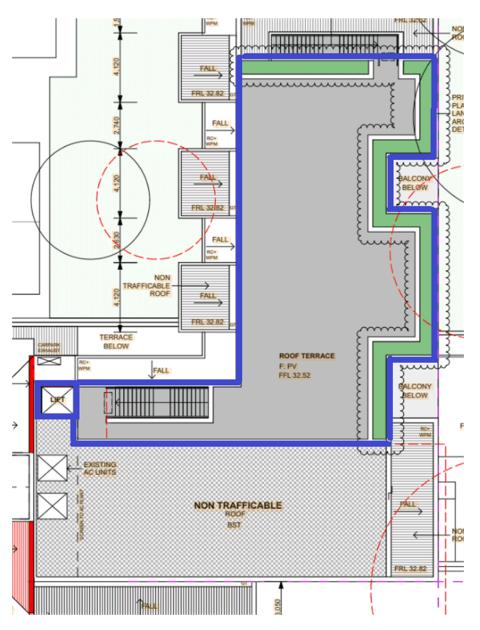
Roof Plan diagram of the proposed development indicating non-compliant elements highlighted in blue. Notably this pertains to the lift overrun and planter boxes on the perimeter of the building.
